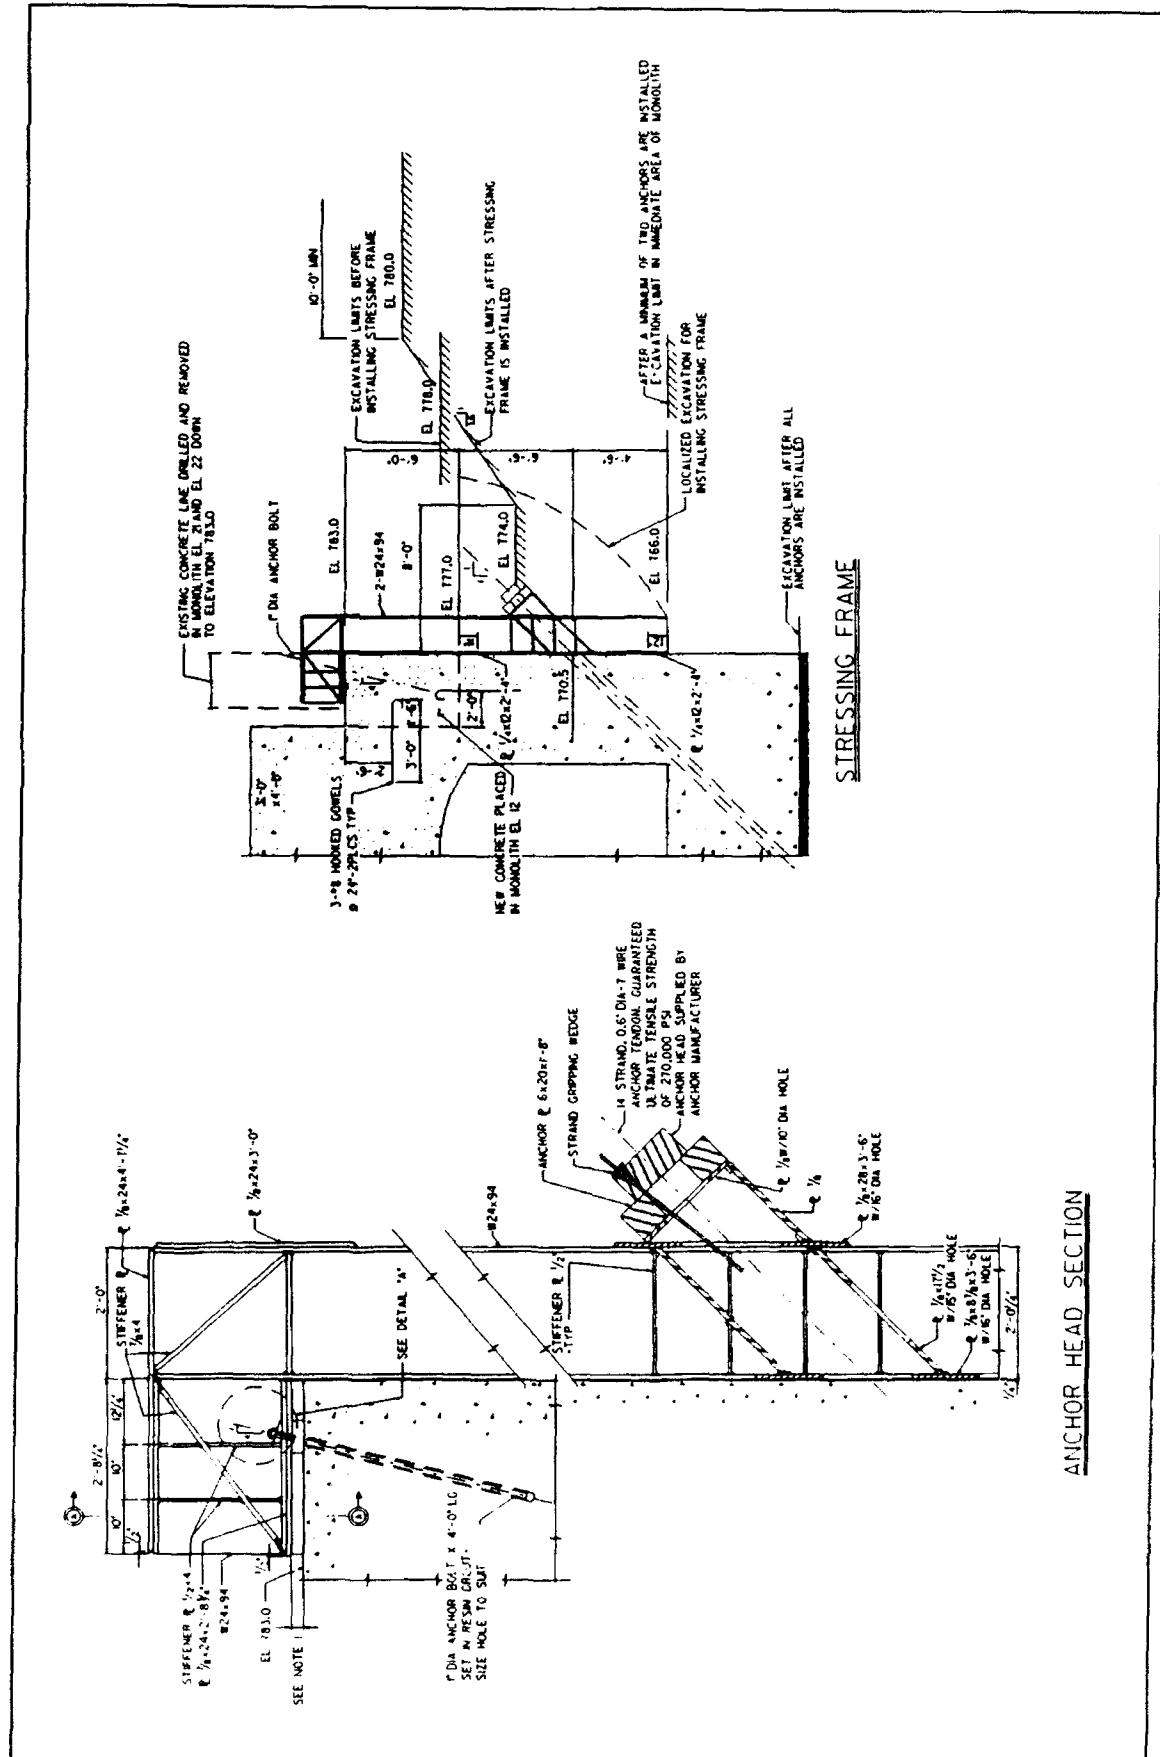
Point Marion Lock cofferdam existing land wall stressing frame
